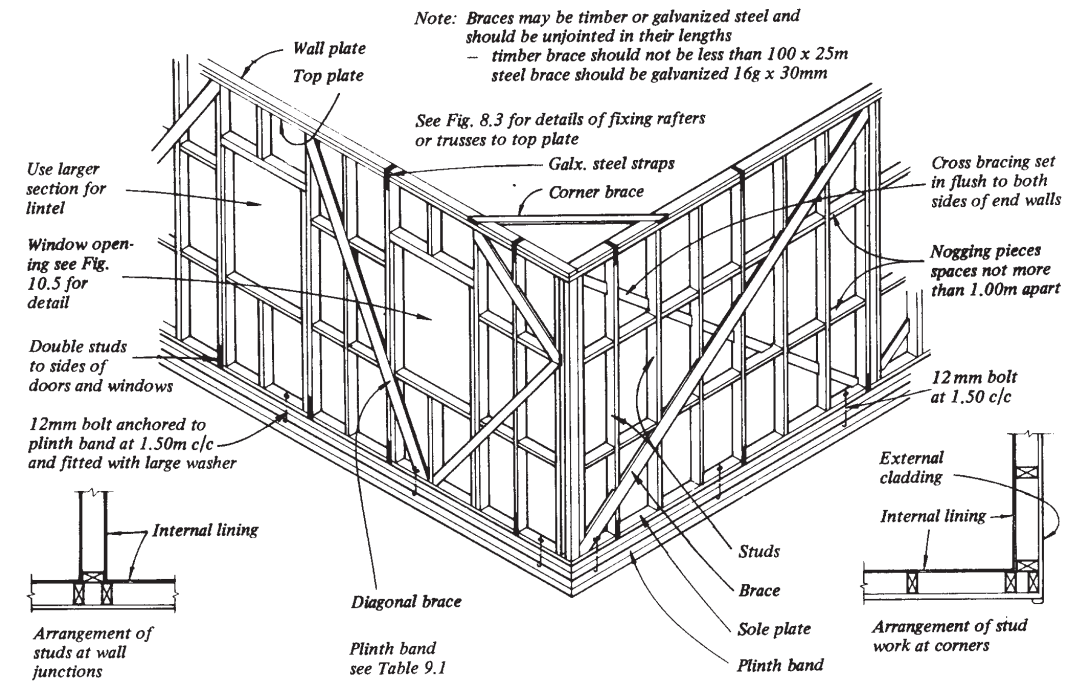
Stud wall construction (Arya, 1987, p. 20)
